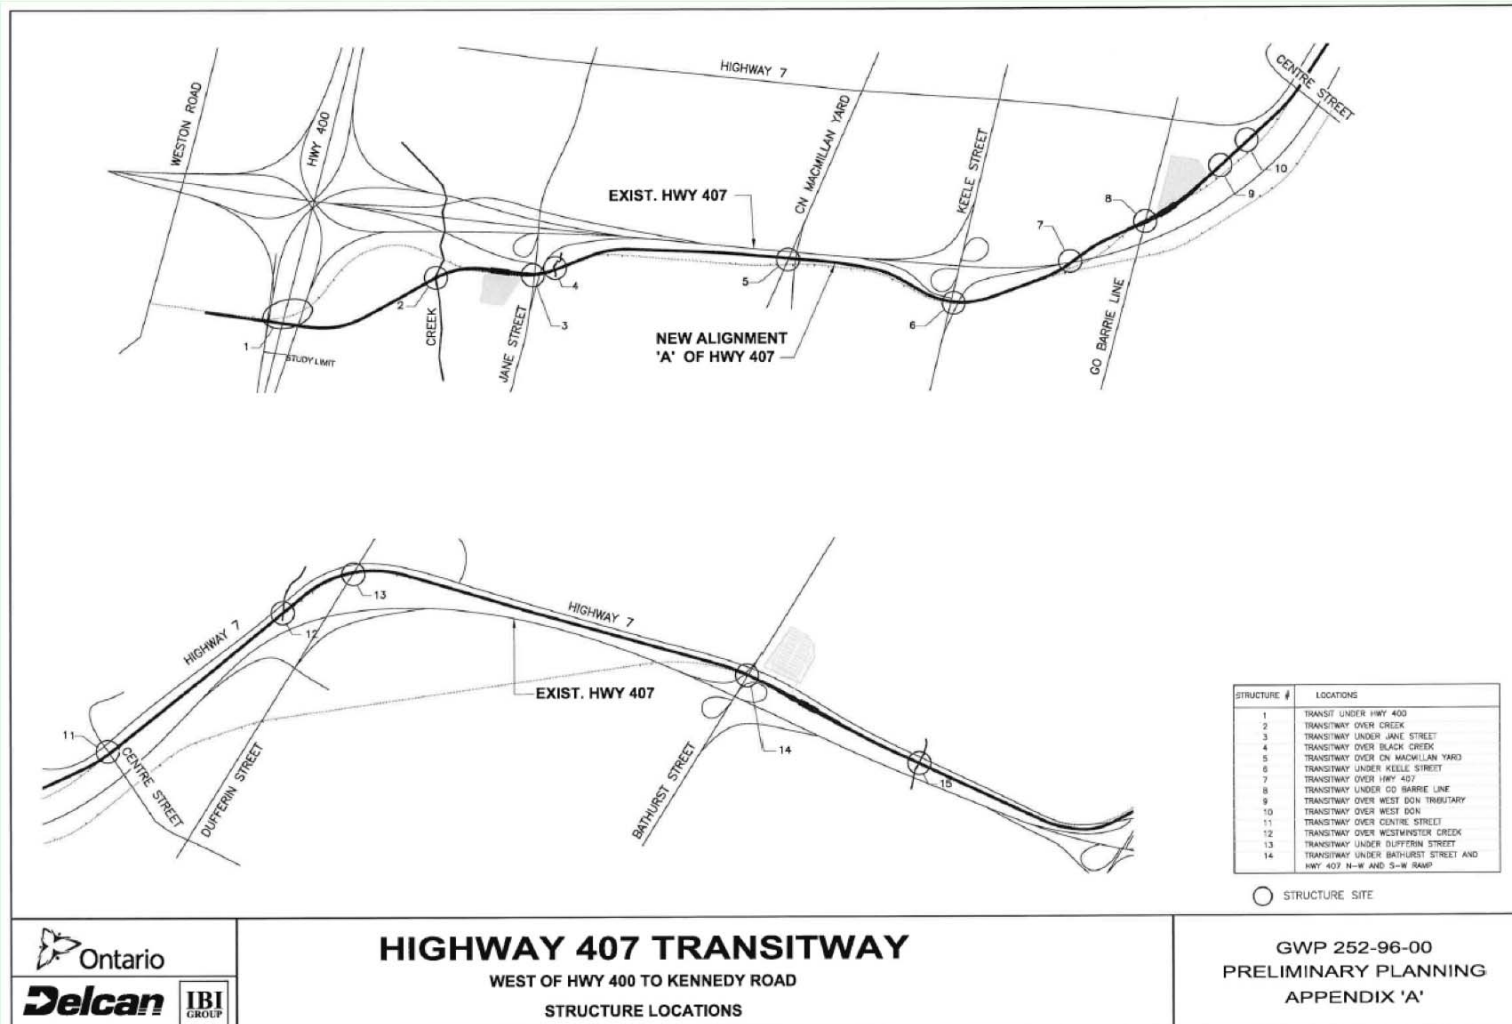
Proposed route 407 LRT and structure location base on 60% drawings from Highway 400 to east of Bathurst Street [Delcan, IBI Group, March 2010].
